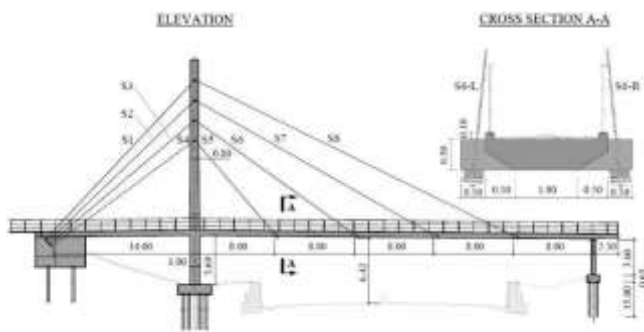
Elevation and deck cross-section of the cable-stayed footbridge (units: m)
